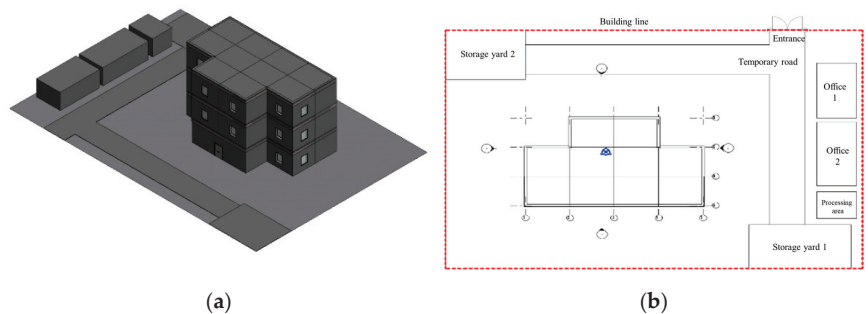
BIM model and site layout (a) BIM model of the building with precast components. (b) Roads and temporary facilities in the construction site layout.
